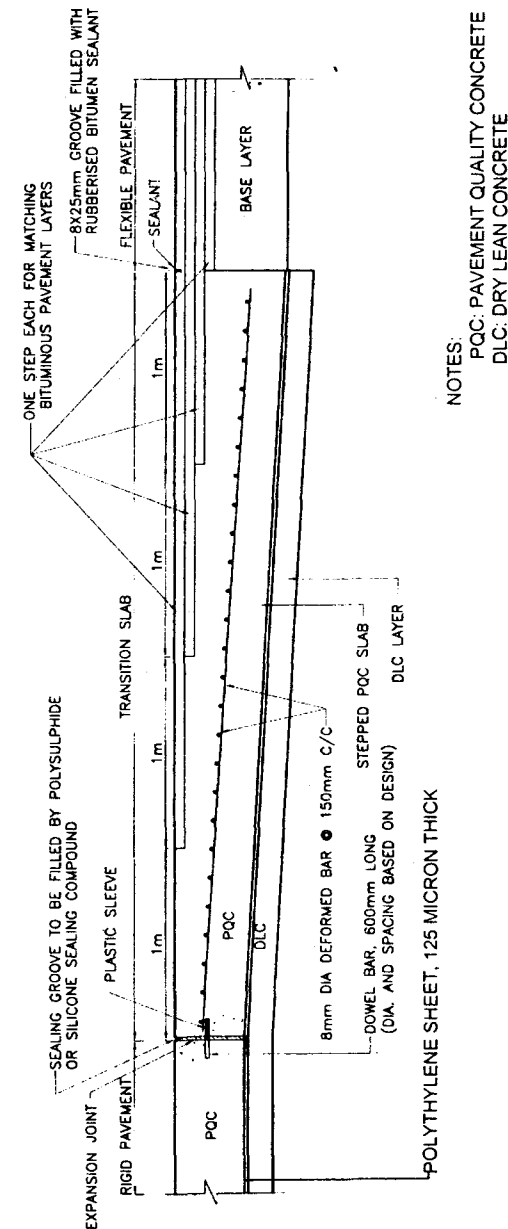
Typical Details of Transition Slab Between Rigid and Flexible Pavement (Clause 9.10.11)
